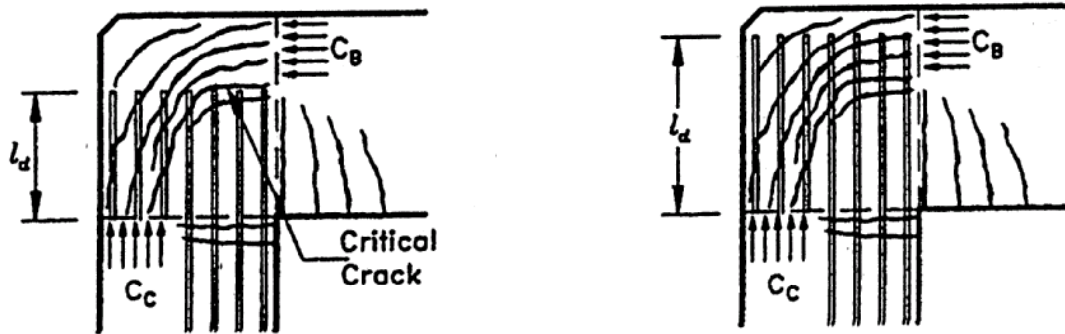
Cracking Pattern Under Opening of the Joint for Insufficient and Sufficient Embedment Rebar Lengths (Adapted from Ingham, 1995)
